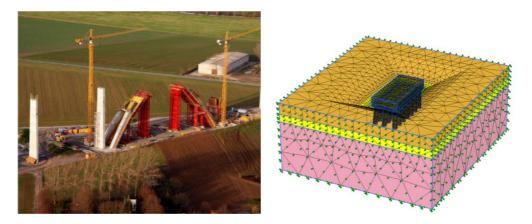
Determination of model boundaries: surrounding, real subsoil (left), FE model of the pile foundation of the arch of the bridge (right)
